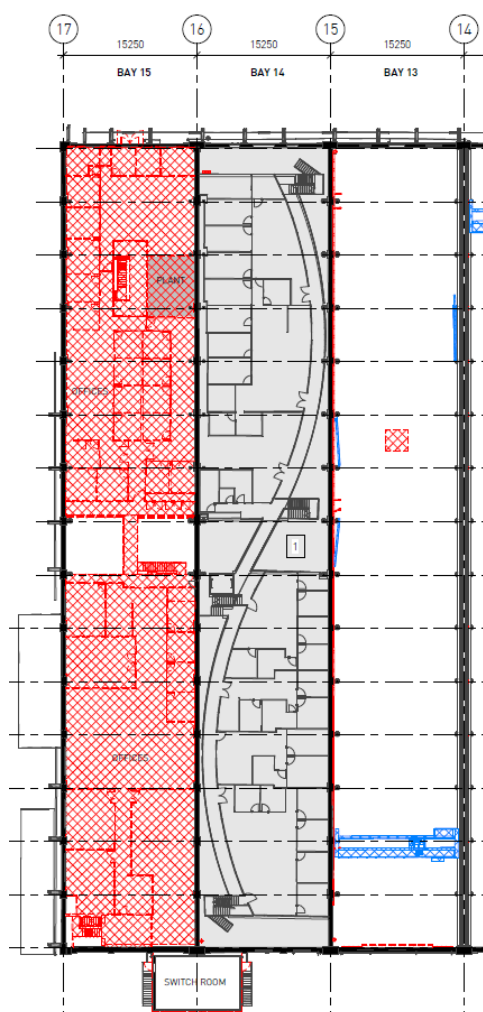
Approved Demolition Plan – First Floor (SA-AR-DWG-BB-B4-0211 Rev N)
